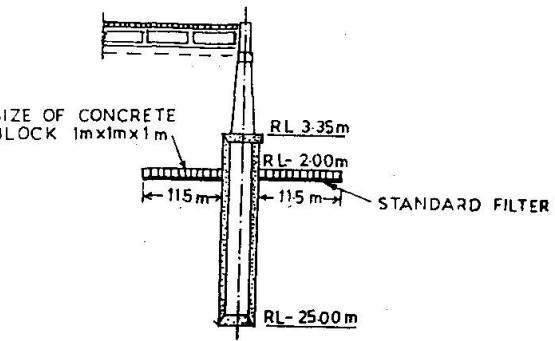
DETAILS OF PROTECTION AT ALAMURU BRIDGE PIER NO.4
